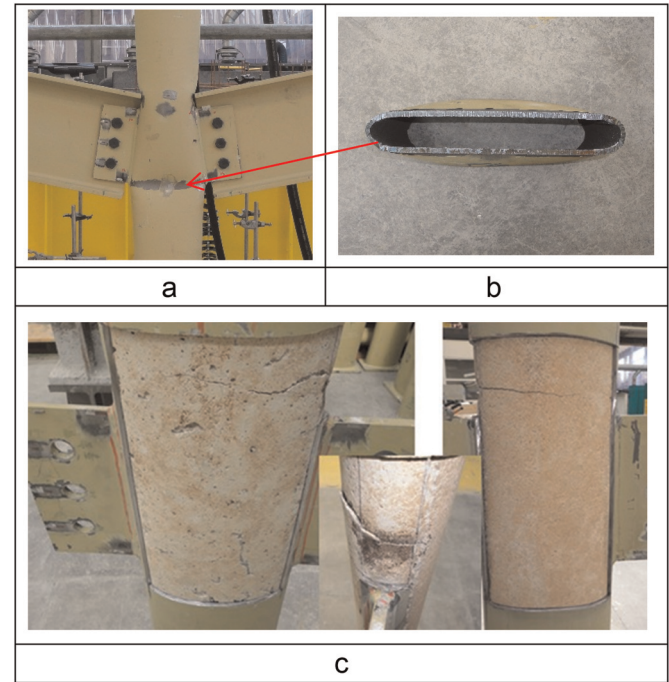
Failure of Type-B connections: (a) Joint-B; (b) bottom cross-section of Joint-B column and (c) core concrete of Joint-BC.
